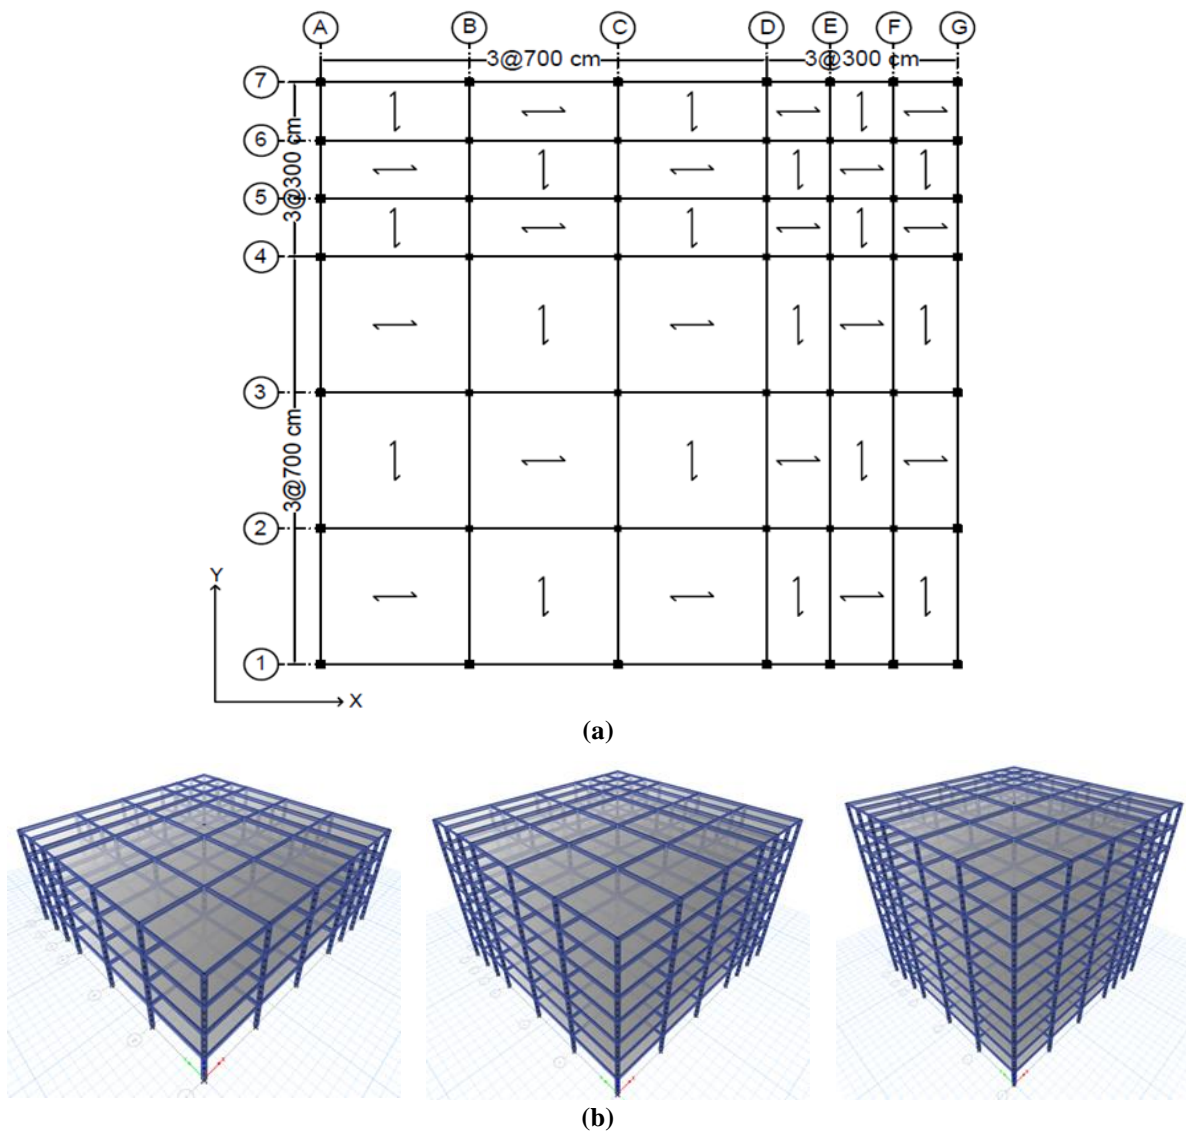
The studied buildings: a) The common story plan; and b) The perspective
